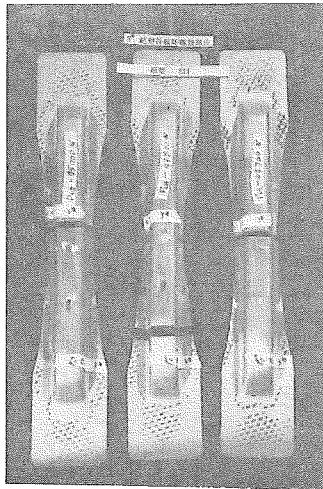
Failure Fractures of 3 SPF Specimens (Depth/Width=0.72)
